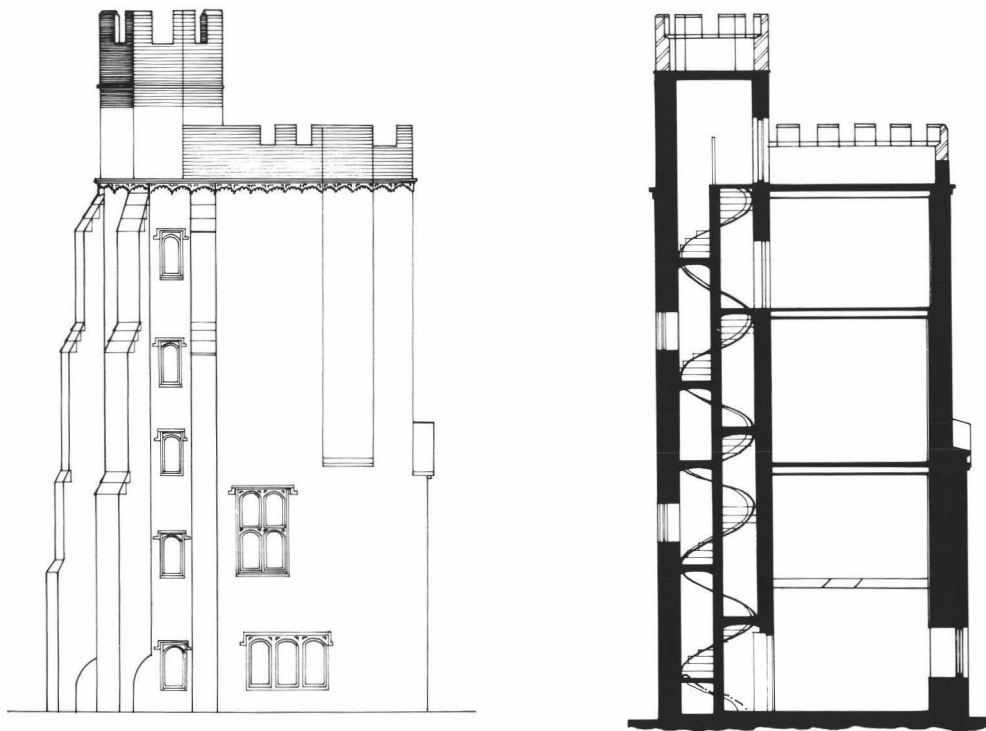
Laughton Place. Scale drawings of the south-east face, section through the tower.
